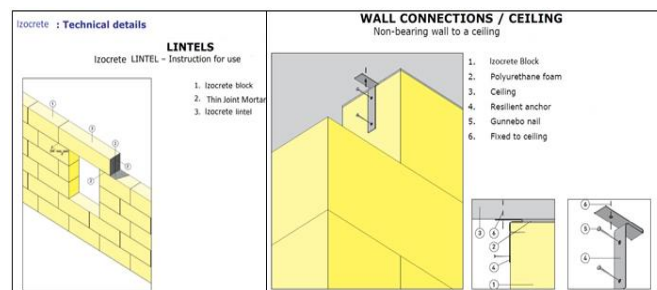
Izocrete blocks for constructing exterior and interior wall layers
